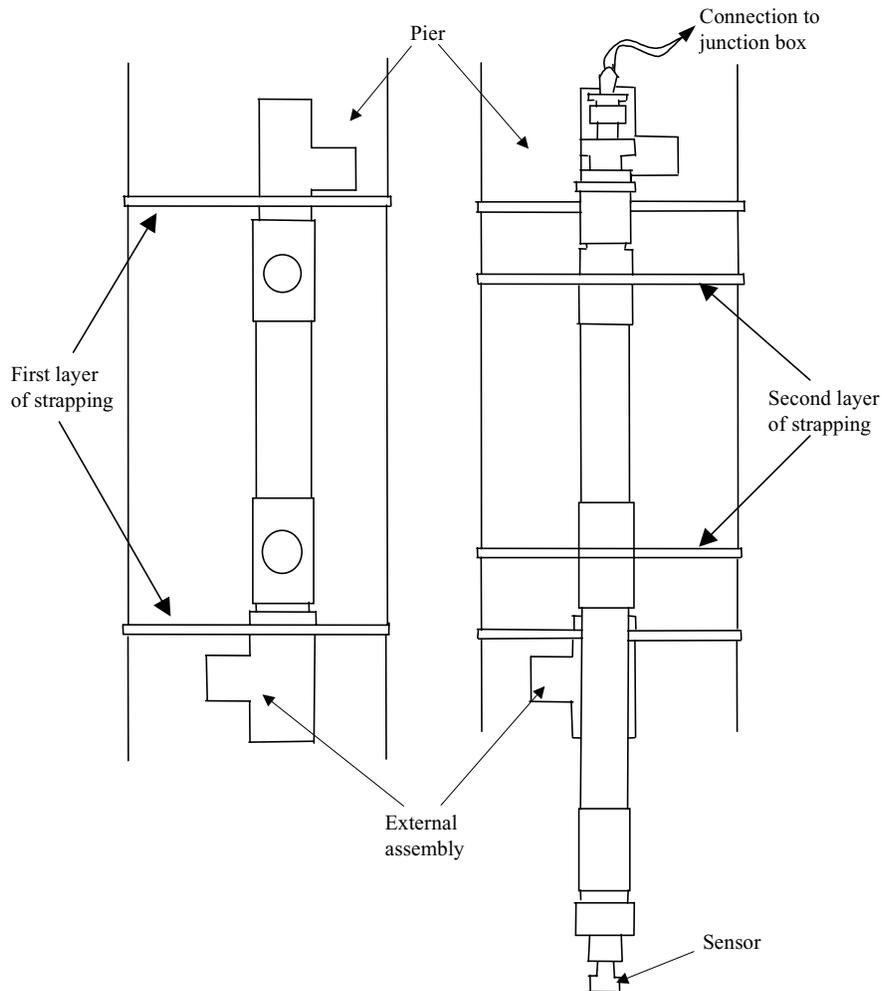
Attaching the ultrasonic mounting assembly to the pier
